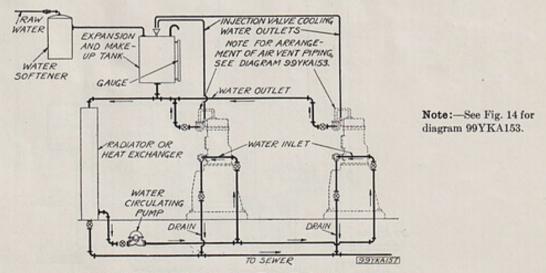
Indirect Cooling System Using Radiator or Heat Exchanger with Pump Circulation
